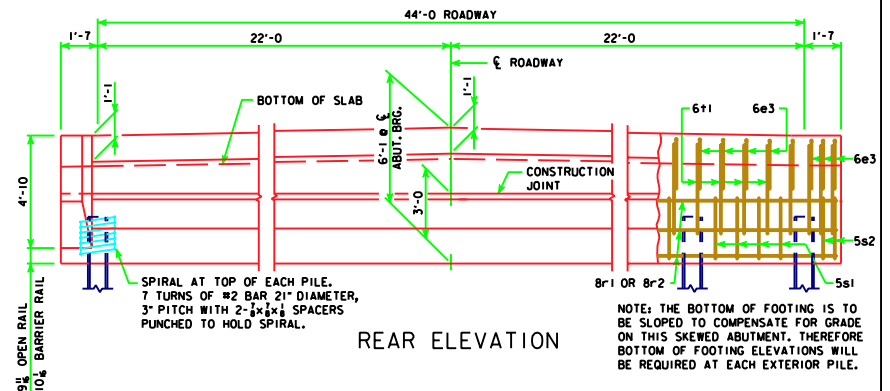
DETAILS ON THIS SHEET ARE TO BE USED ONLY WHEN ABUTMENTS ARE PLACED ON STEEL PILES. IF ROCK IS ENCOUNTERED CLOSER THAN 12' BELOW ABUTMENT FOOTING, SPECIAL ANALYSIS MAY BE REQUIRED.
